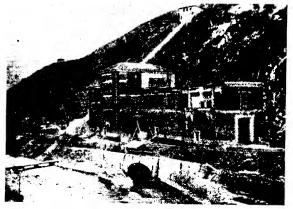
Illustration VI - 5. Krichim hydroelectric plant. The plant when under construction, seen from the right bank looking downstream.
